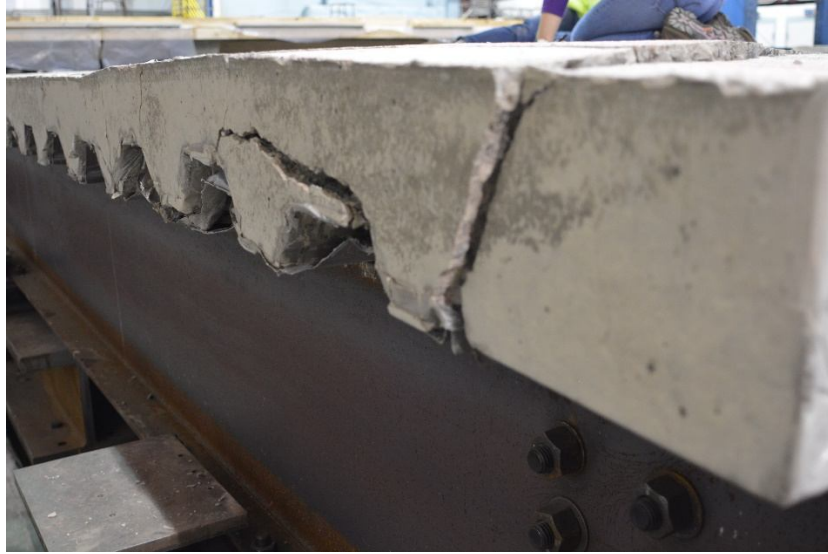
Deck Debonding and Overhang Cracking (Point D in Figure 3-13)
